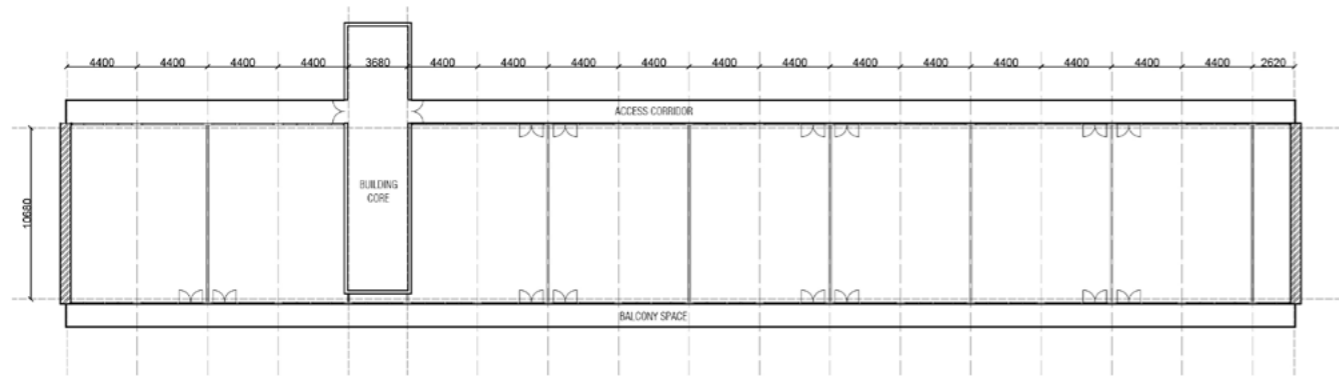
Menno ter braaklaan - Floor plan (Source: author)
